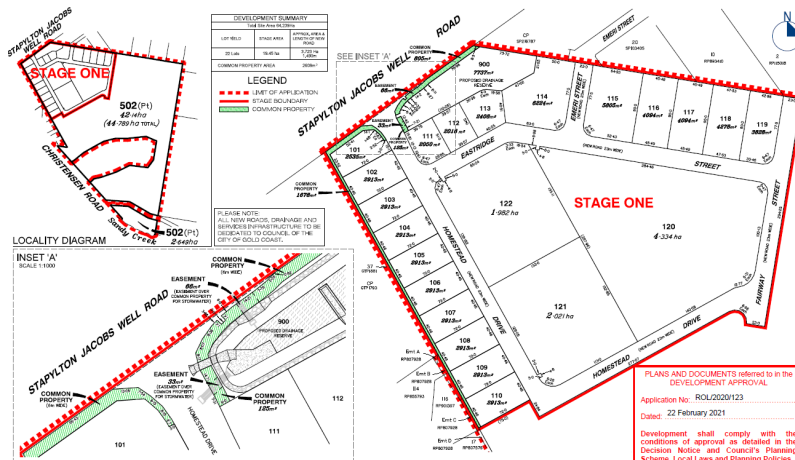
Subdivision Plan Stage One – ROL/2020/123 (GDP File, 2024)
